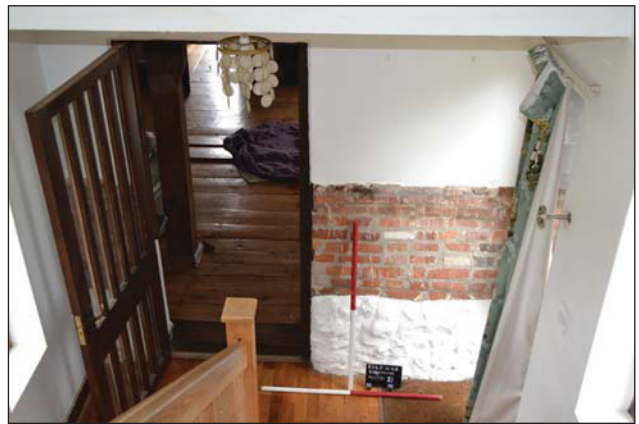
Room 3, wall detail, looking north-east, Scales: 1m.
